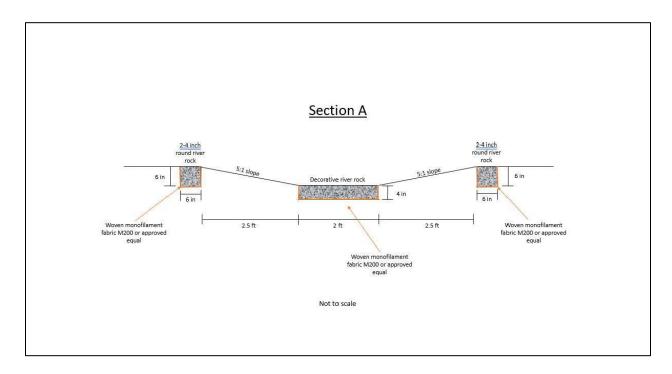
Cross-section design for Section A of the Townwood Park GSI project.
